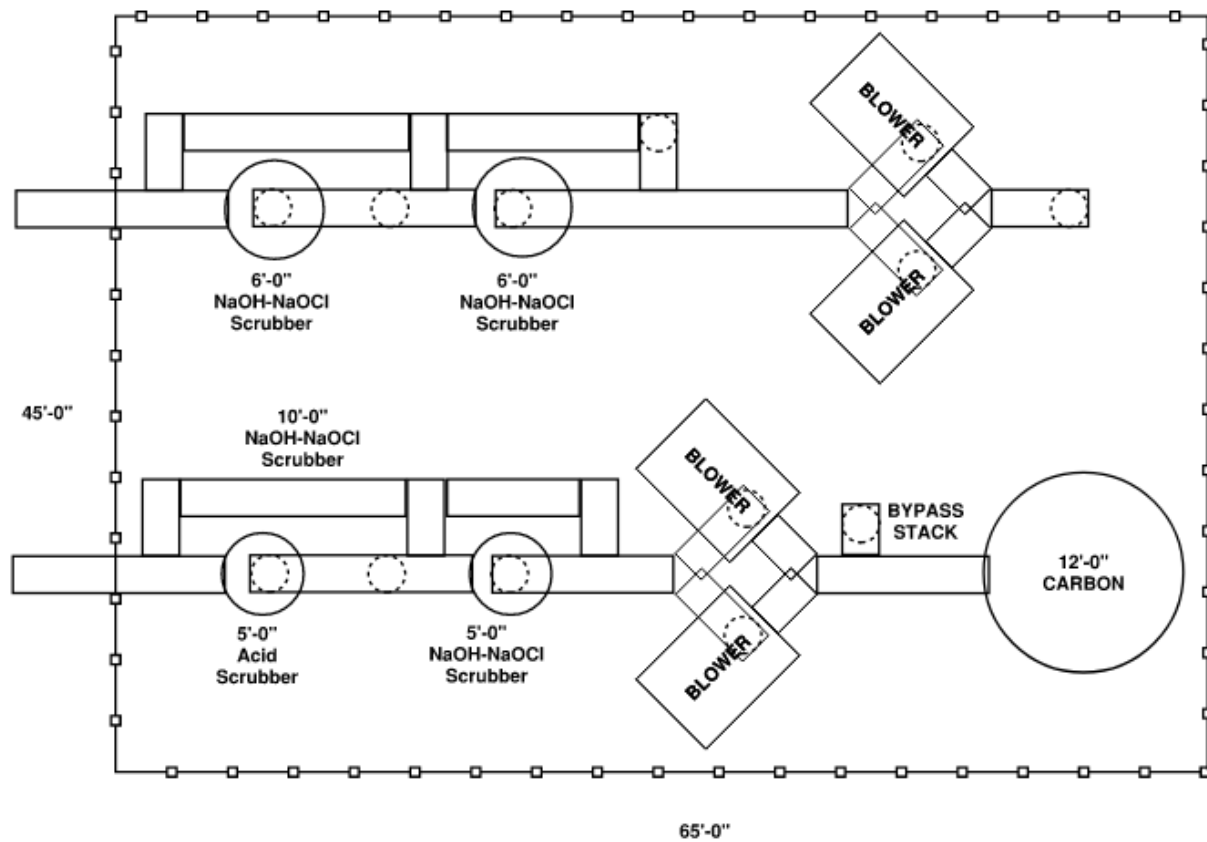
Layout of Pad for Odor Treatment Systems Treating Exhaust from Sludge Storage and Pre-dewatering Sources and Exhaust from Final Dewatering Sources under Alternative 2
